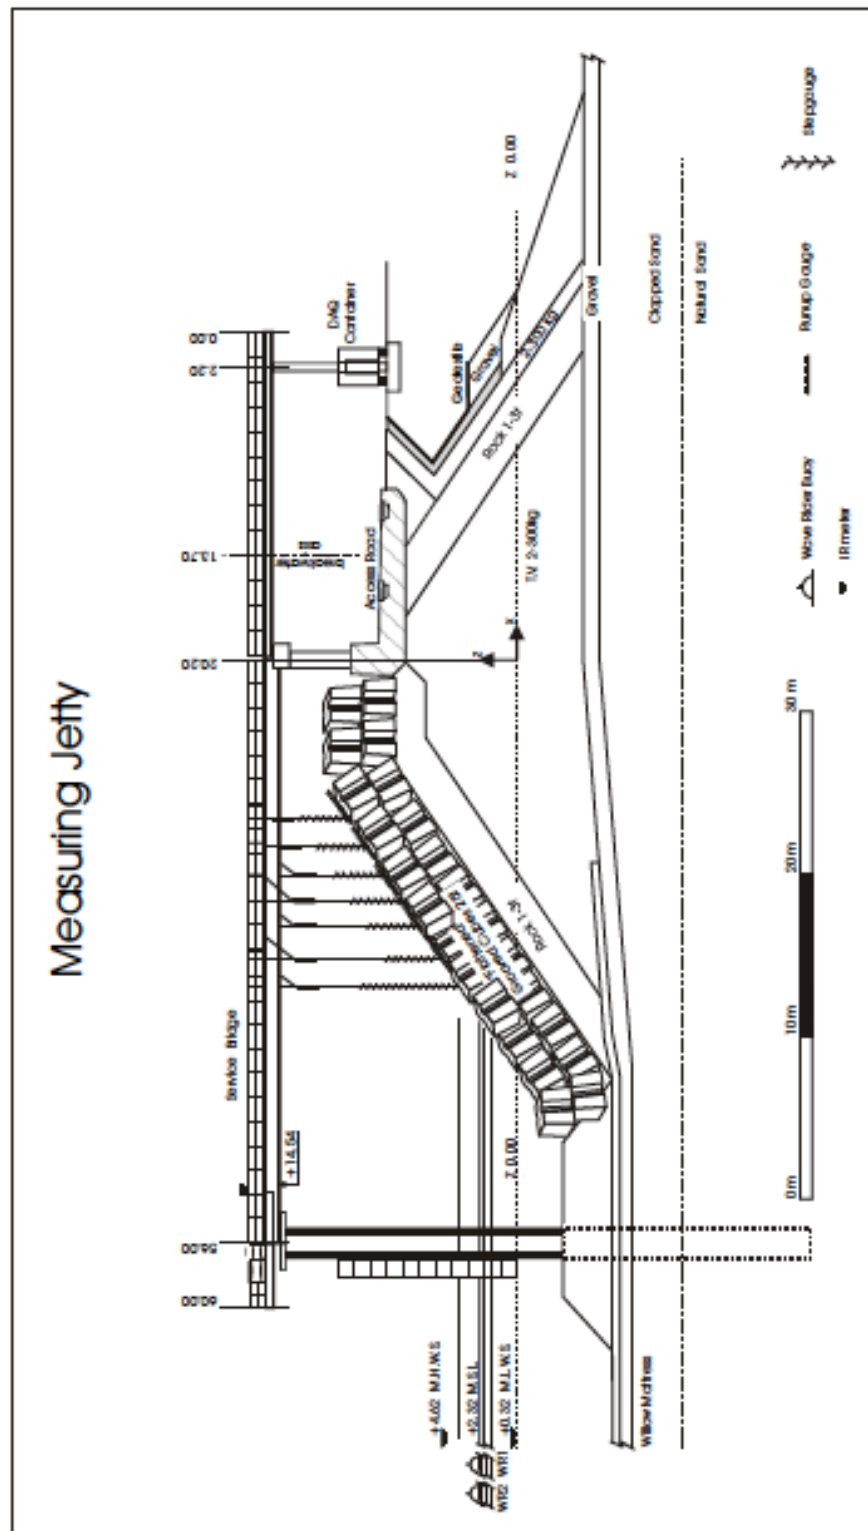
Cross-section of the Zeebrugge breakwater with measurement jetty and locations of the instruments
